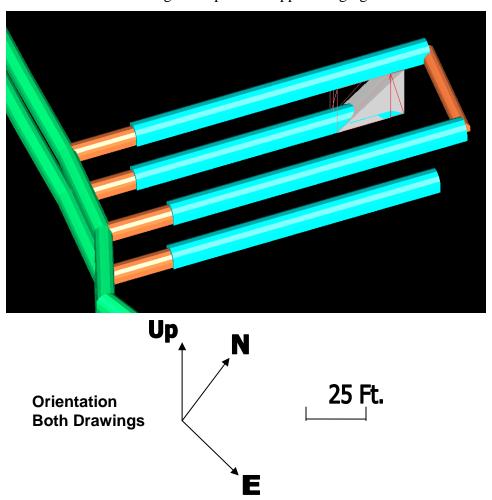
Production Blasting from Hanging Wall to Footwall in the Stope
